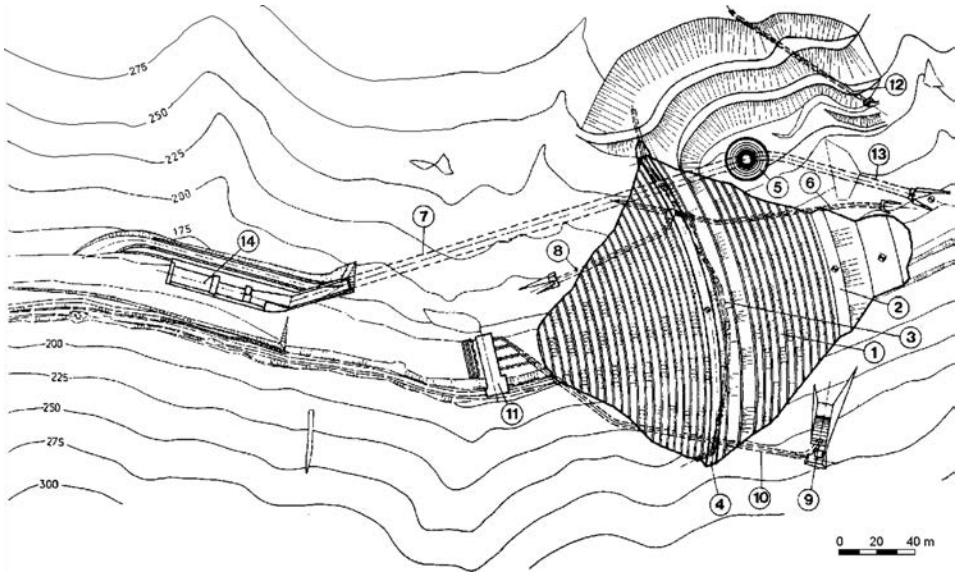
Site plan of the Tikvesh hydraulic scheme. (1) Dam; (2) cofferdam; (3) grout curtain; (4) dam axis; (5) spillway shaft; (6) bottom outlet; (7) outlet tunnel; (8) access gallery; (9) intake; (10) supply tunnel; (11) power house; (12) irrigation tunnel; (13) diversion tunnel.
